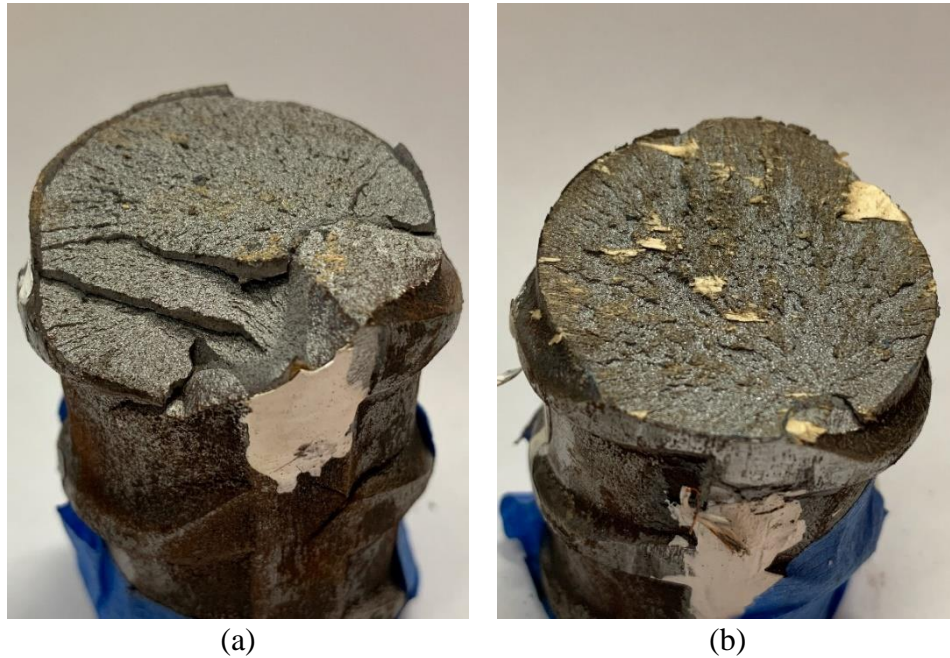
Fracture Surface of (a) Spec12 (SH4); (b) Spec15 (SH4)
